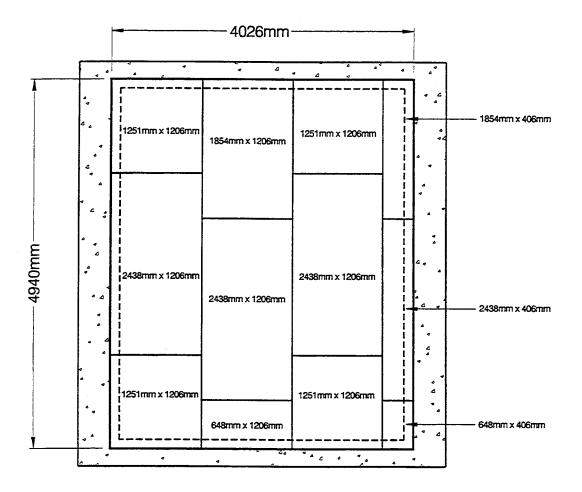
Single layer subfloor layout, joists 610 mm o.c.
